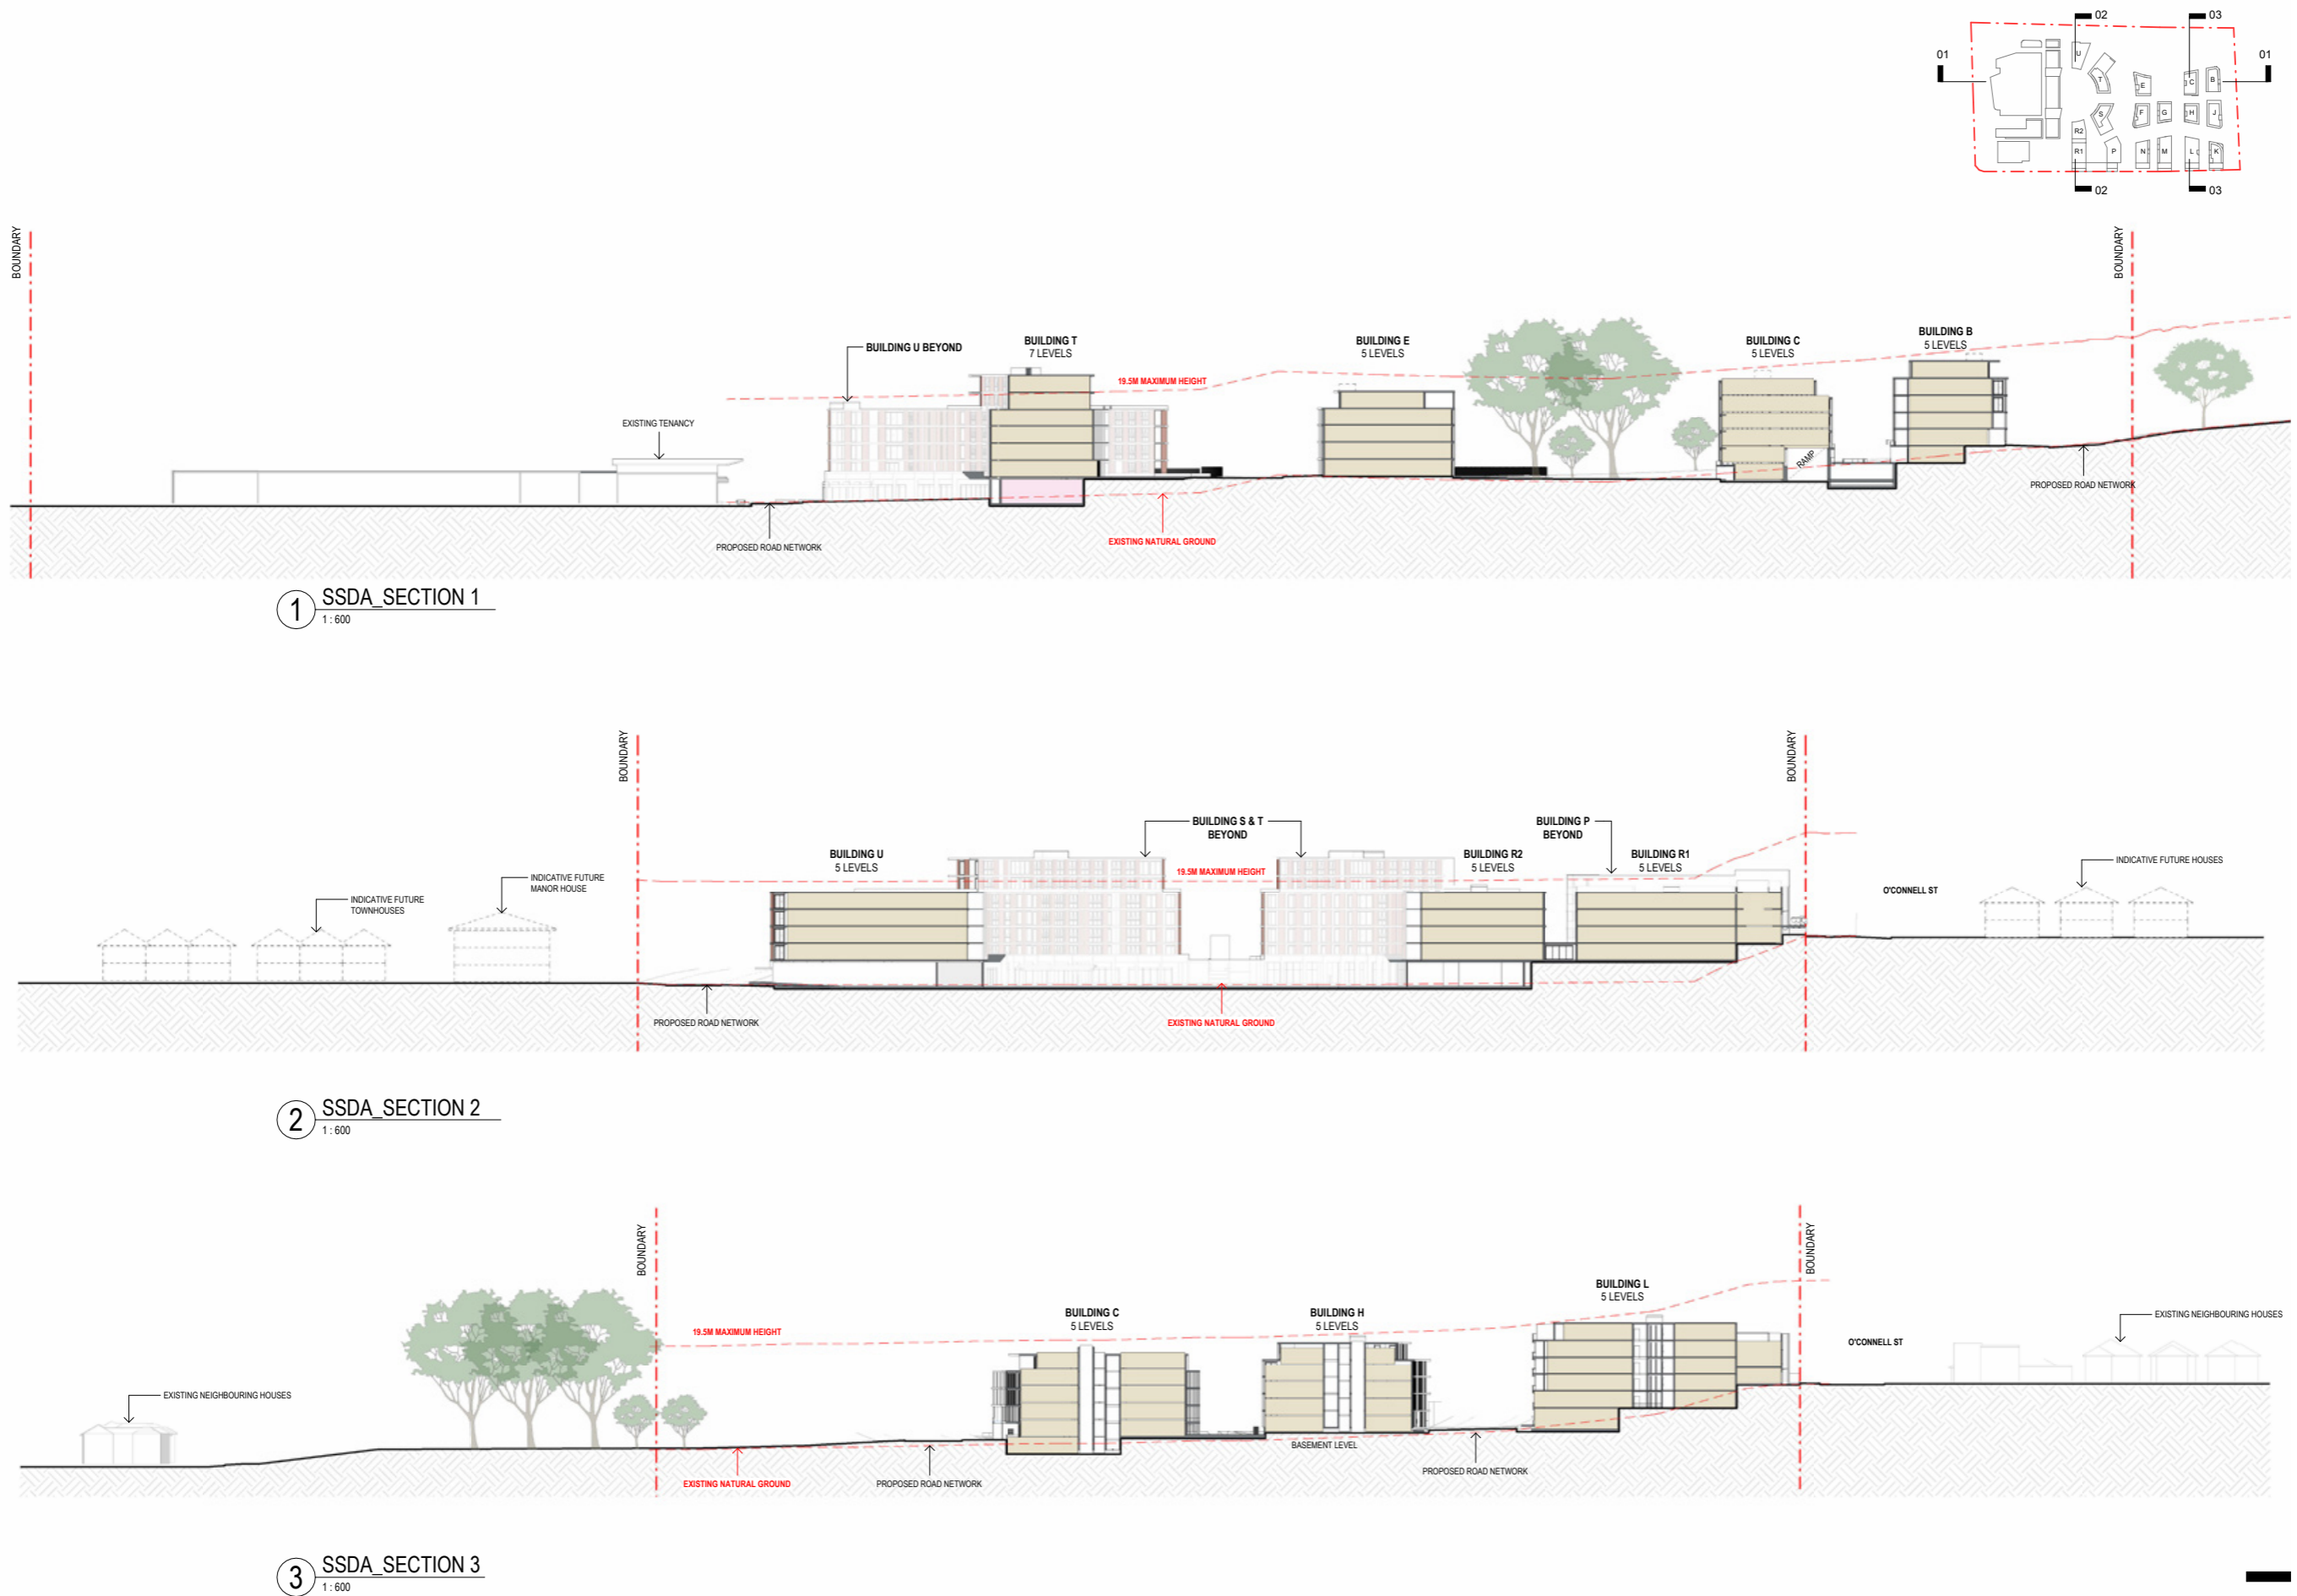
Sections Type A - Contextual Sections, Created by Group GSA July 2025
